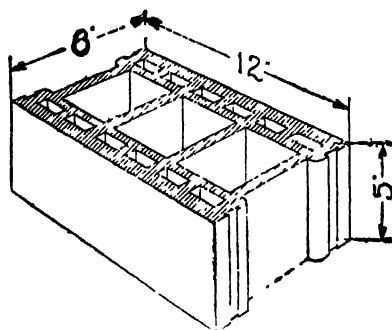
,761.—Natco 8 in. double shell tile. *Types, glazed:* One scratched face  $12 \times 5$ , and one smooth face  $12 \times 5$ , giving an exterior finish similar to a rough face brick and a smooth impervious interior. *Un glazed:* Two scratched faces  $12 \times 5$ , giving a choice of two faces for an exterior finished surface similar to a rough face brick and an interior scratched surface rough enough for the application of ordinary plaster directly to the hollow tile surface.
